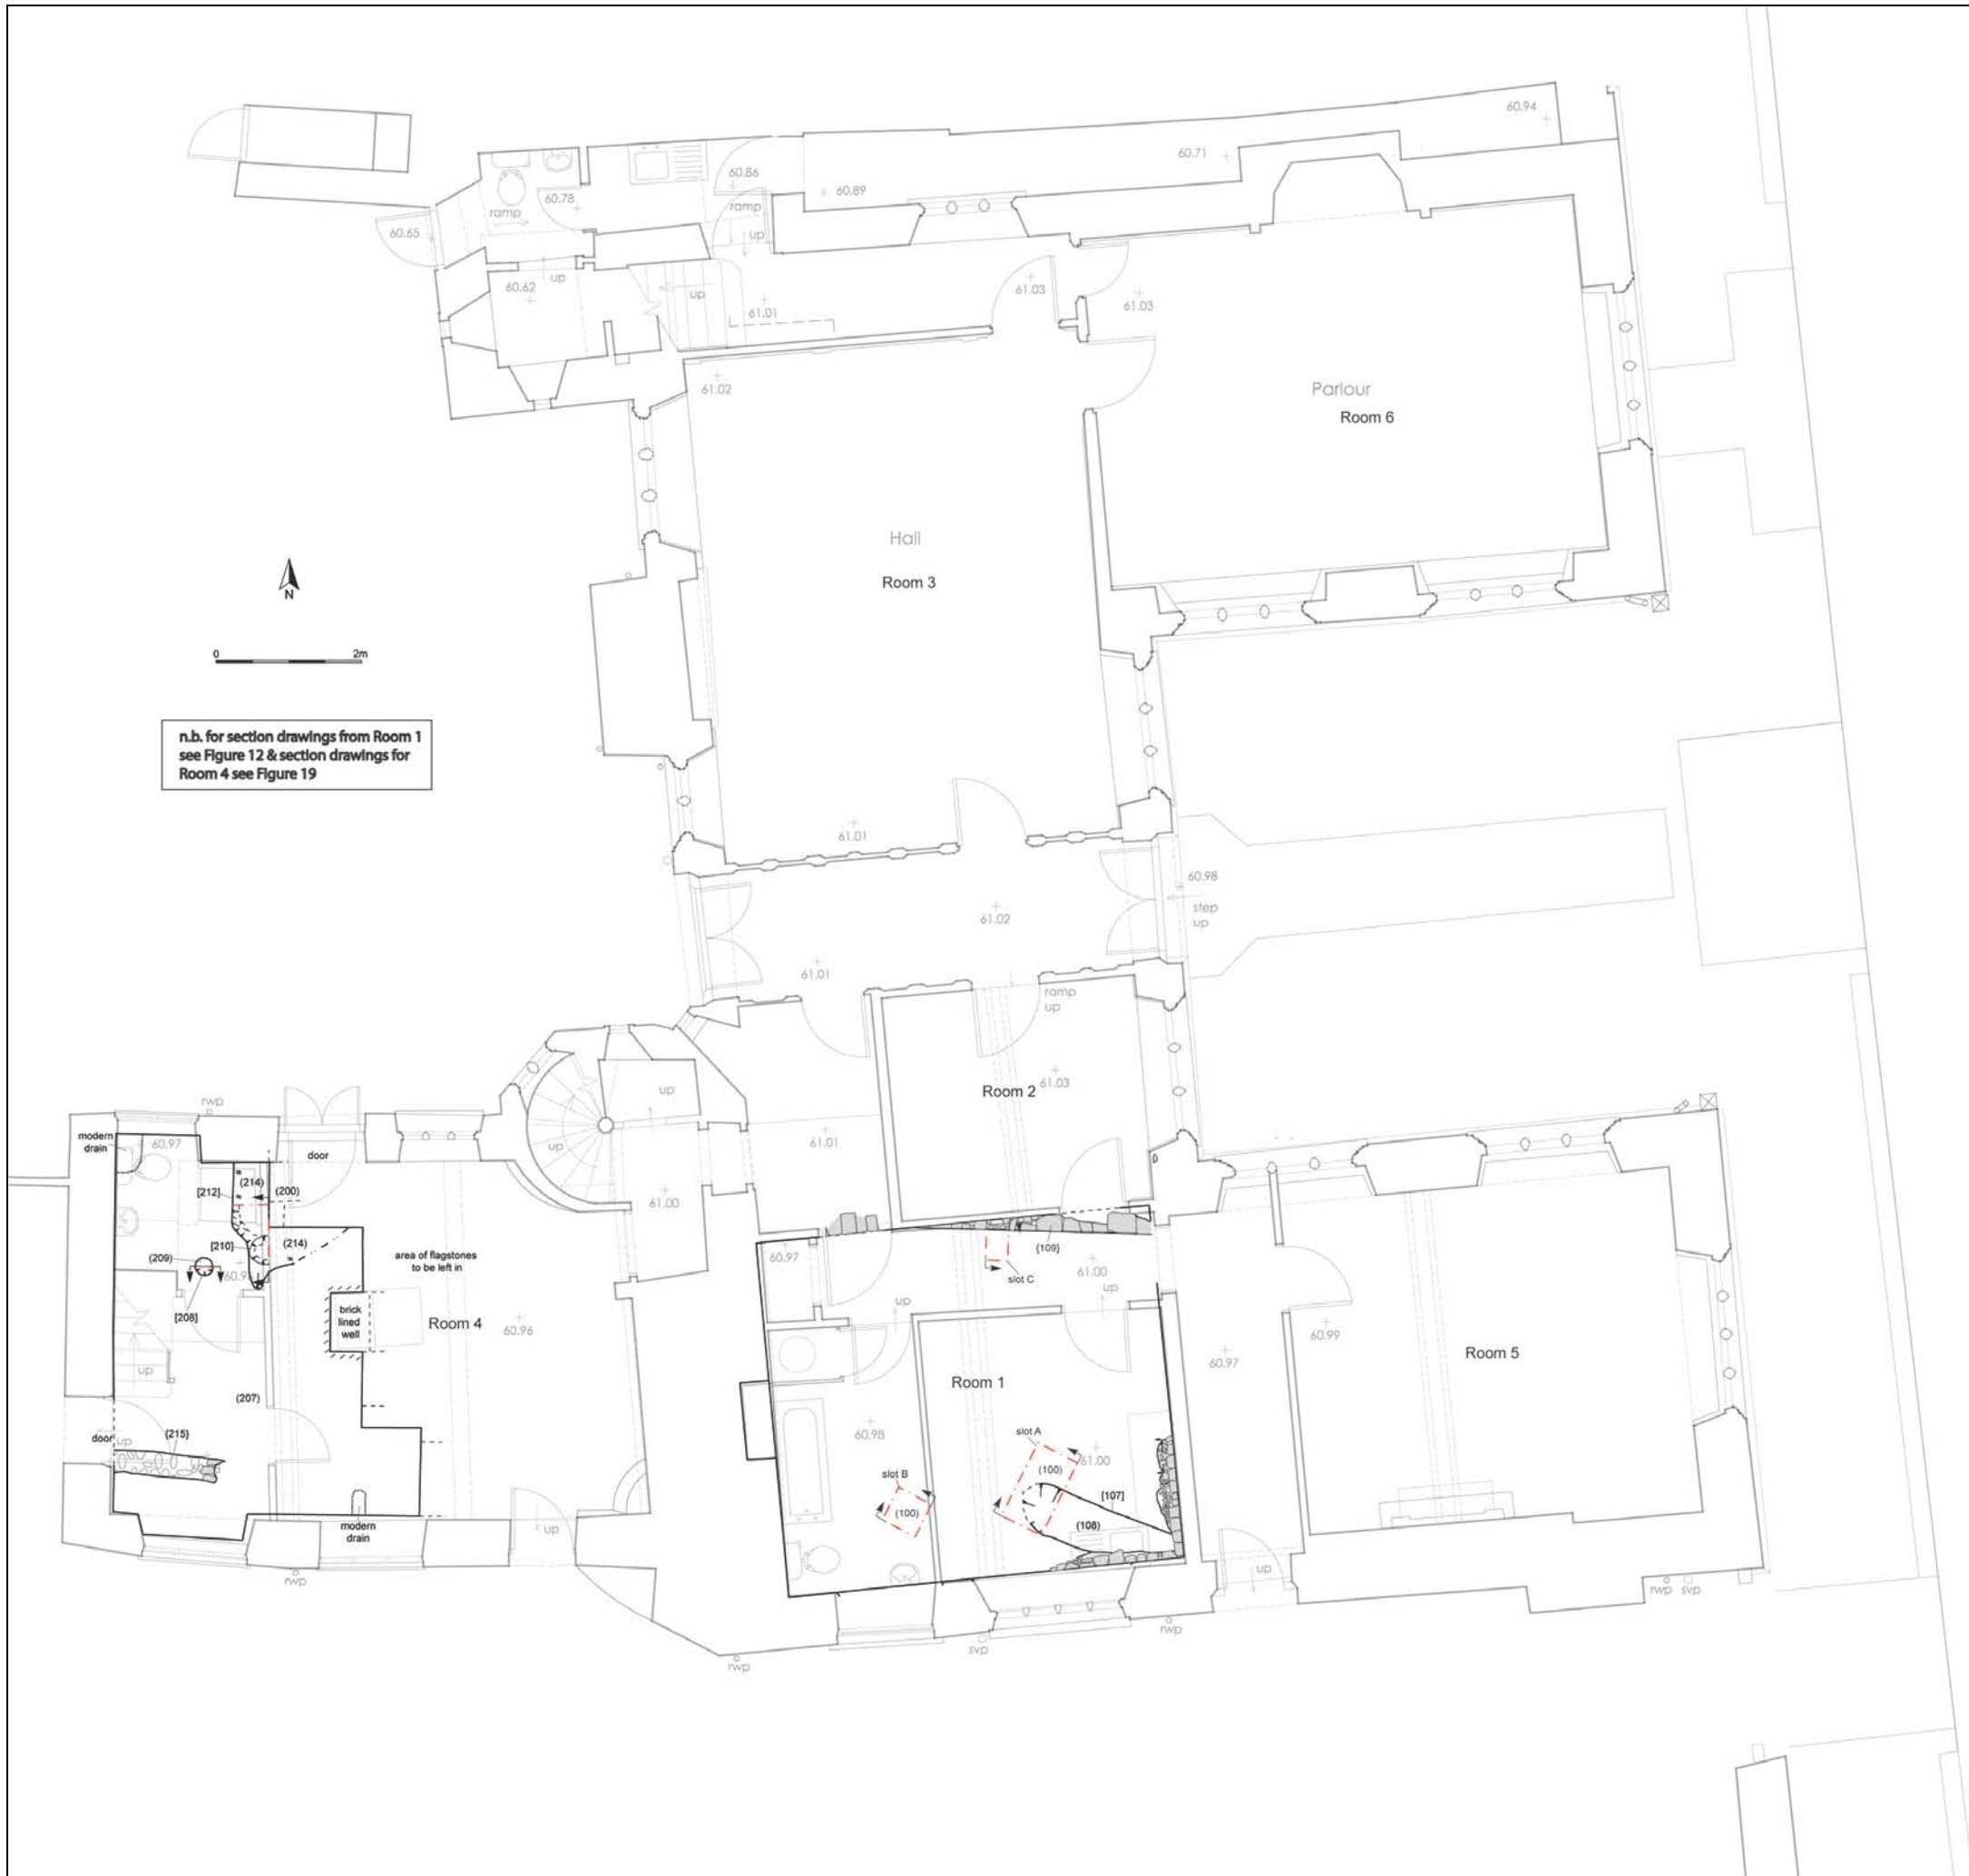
Plan of the existing ground floor layout with all identified buried features.
